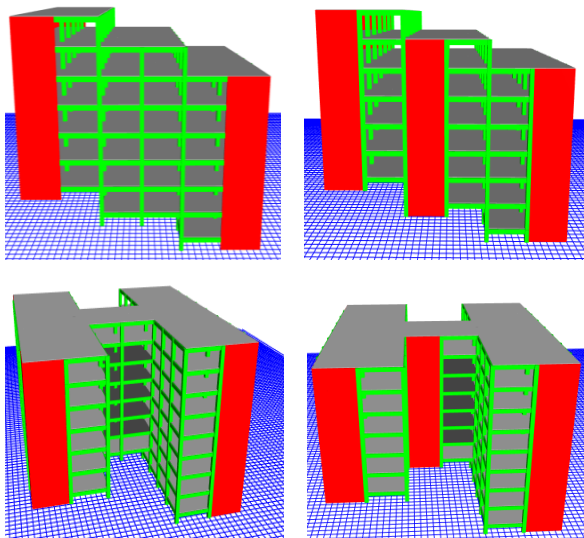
Elevation of H Shape Structure & Step Back Set Back Structure
